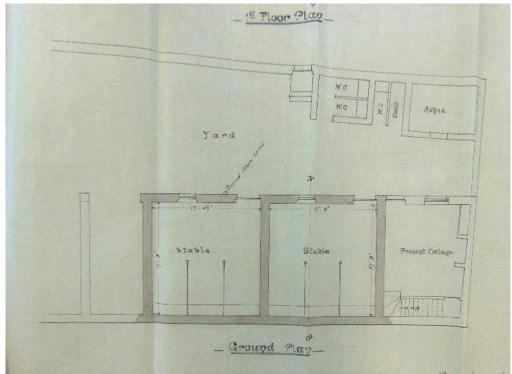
Detail plan of the yard from 1887 (CA/E4/1862)
